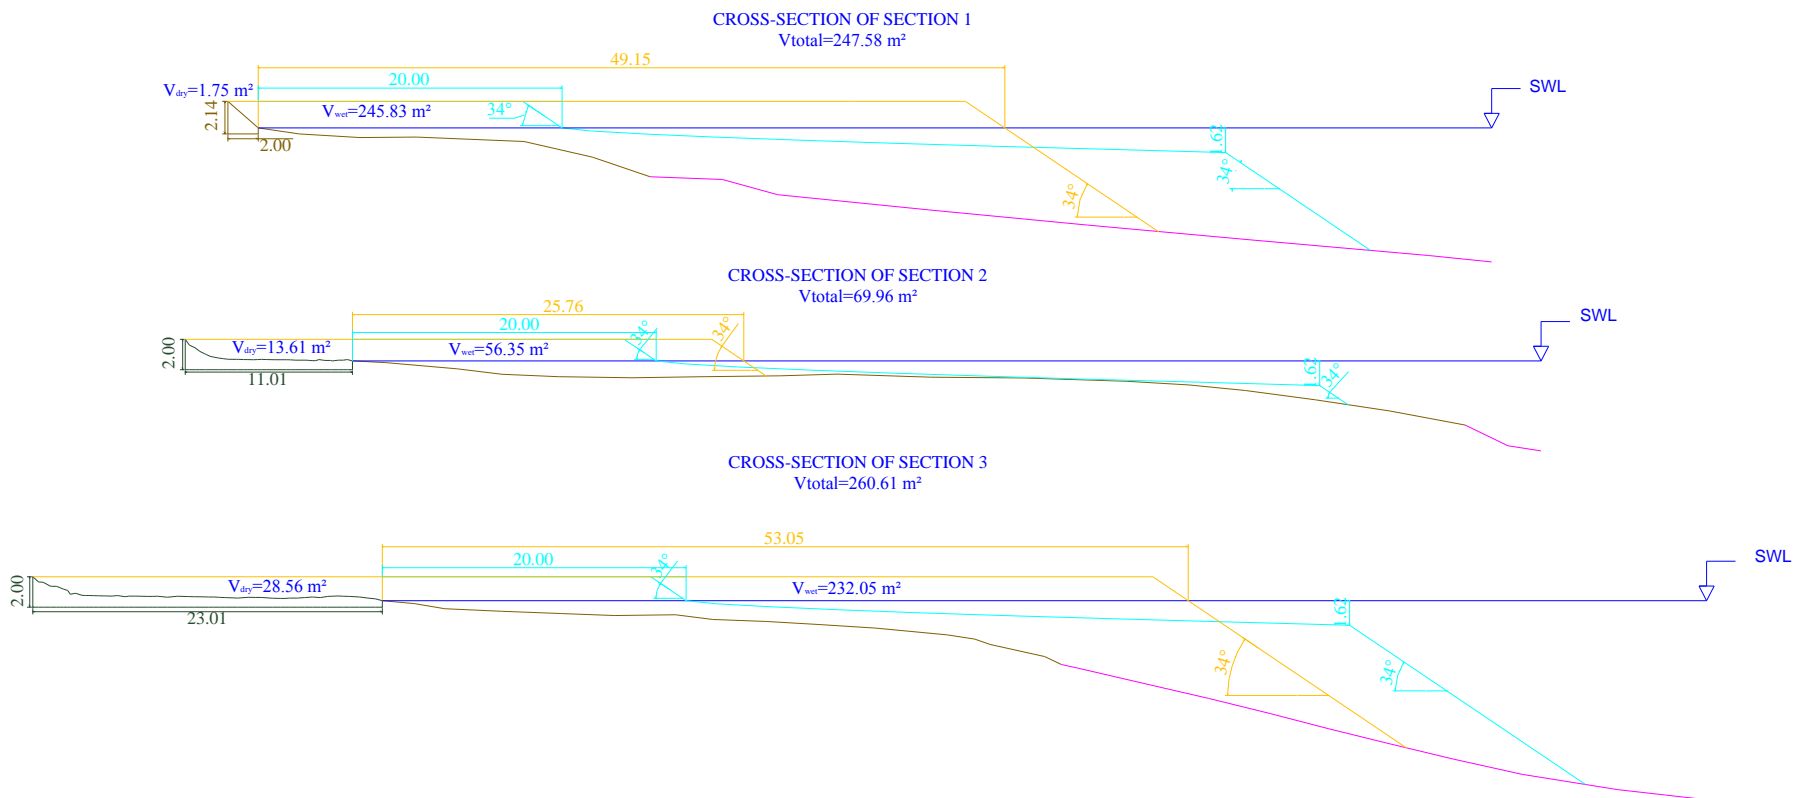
Design profiles of Section 1,2 and 3 for 20 m new dry beach width ($D_{fill}=0.32$ mm).
